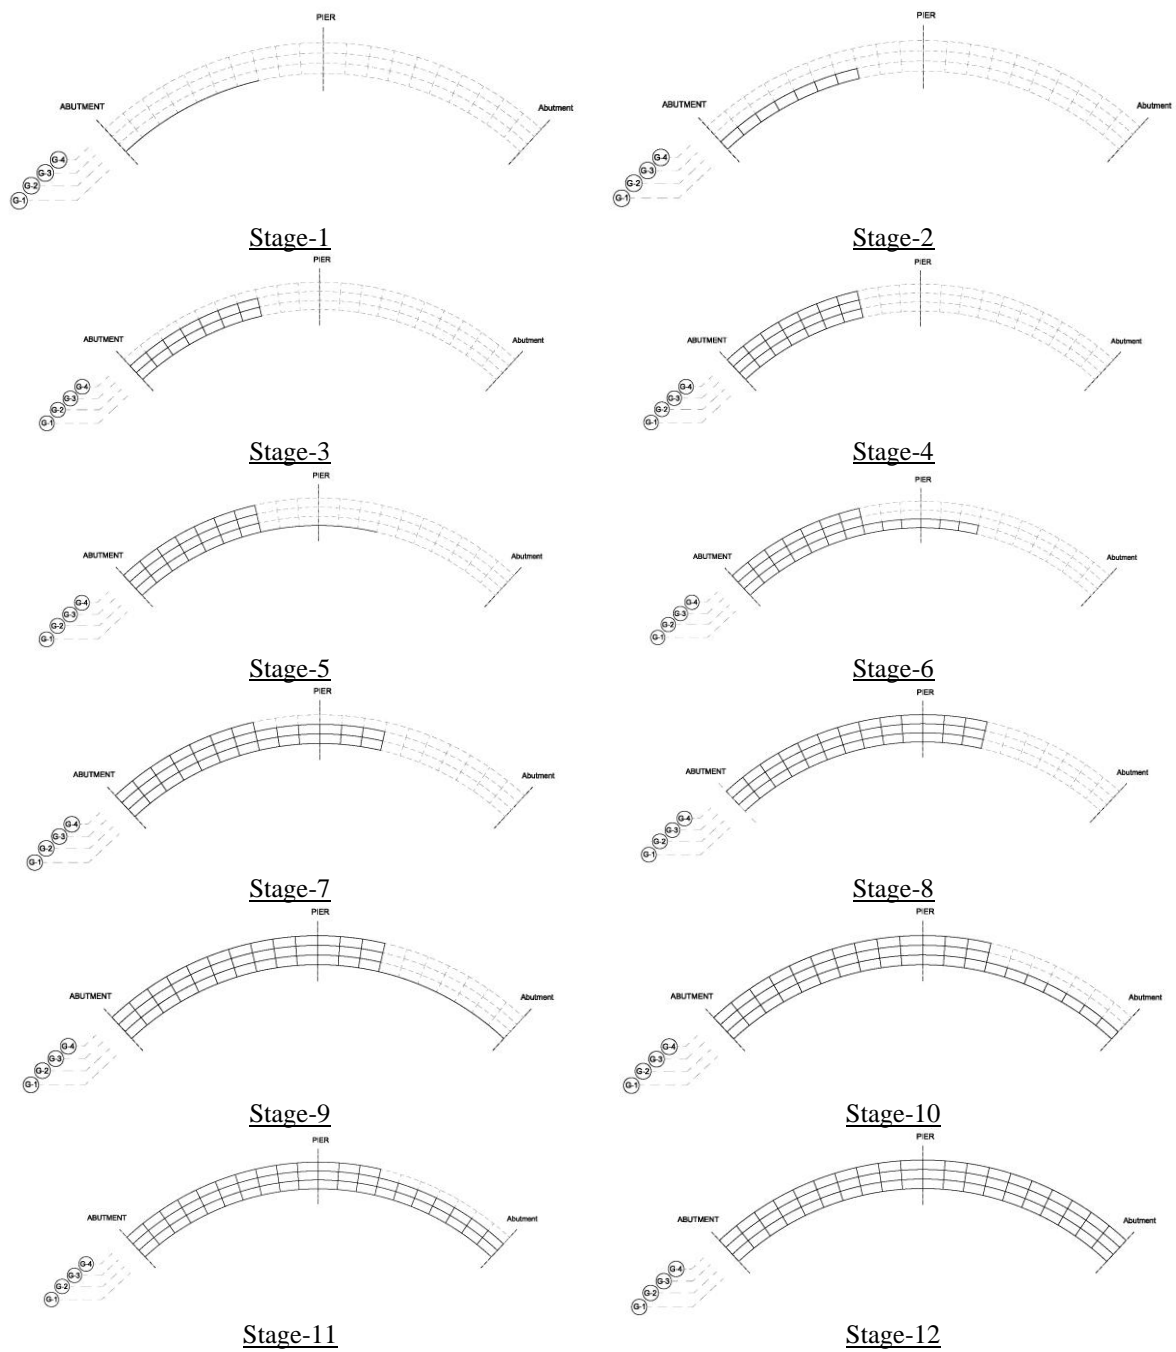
Stage 1 to Stage 12 of Construction for Single-Girder (inner girder placed first) Erection of Two-Equal-Span, 4-Girder Bridges.
